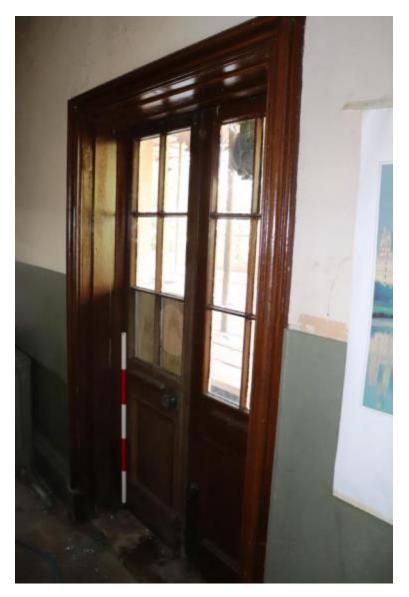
Phase 3 doorway through the south-west facing, looking south, scale 1m
